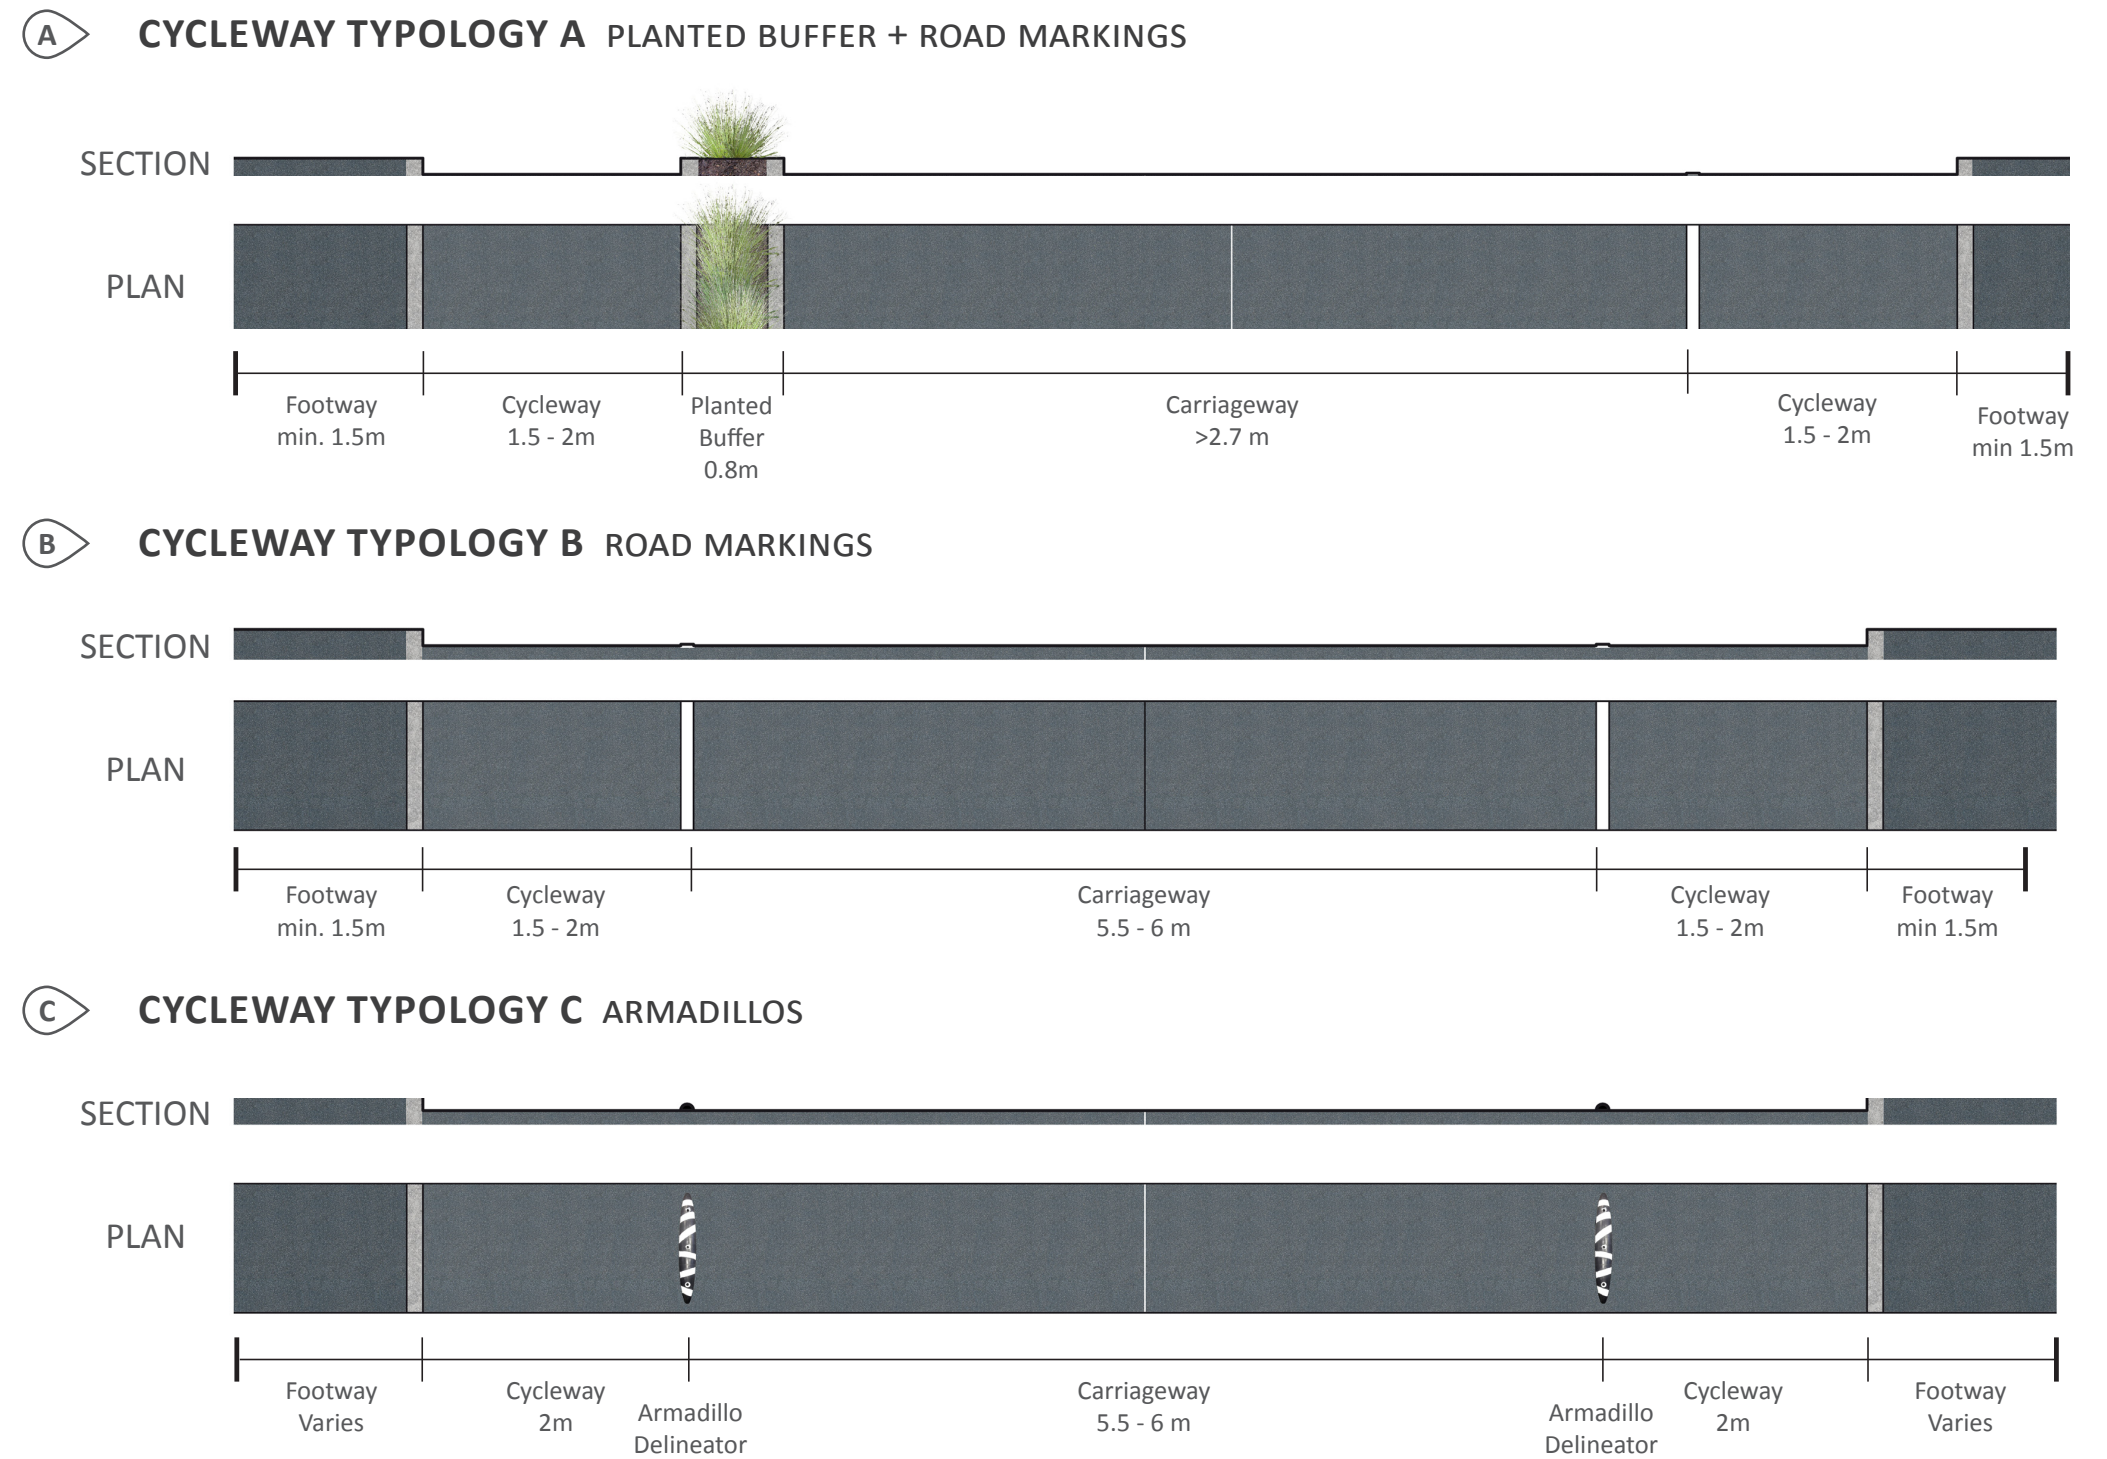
Typical Proposed Cycleway Typologies Plan and Sections
